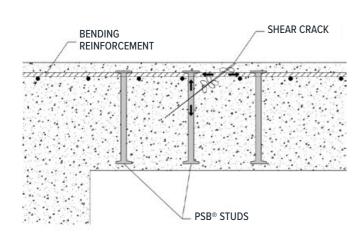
Figure of an inclined crack with vending and vertical reinforcement
